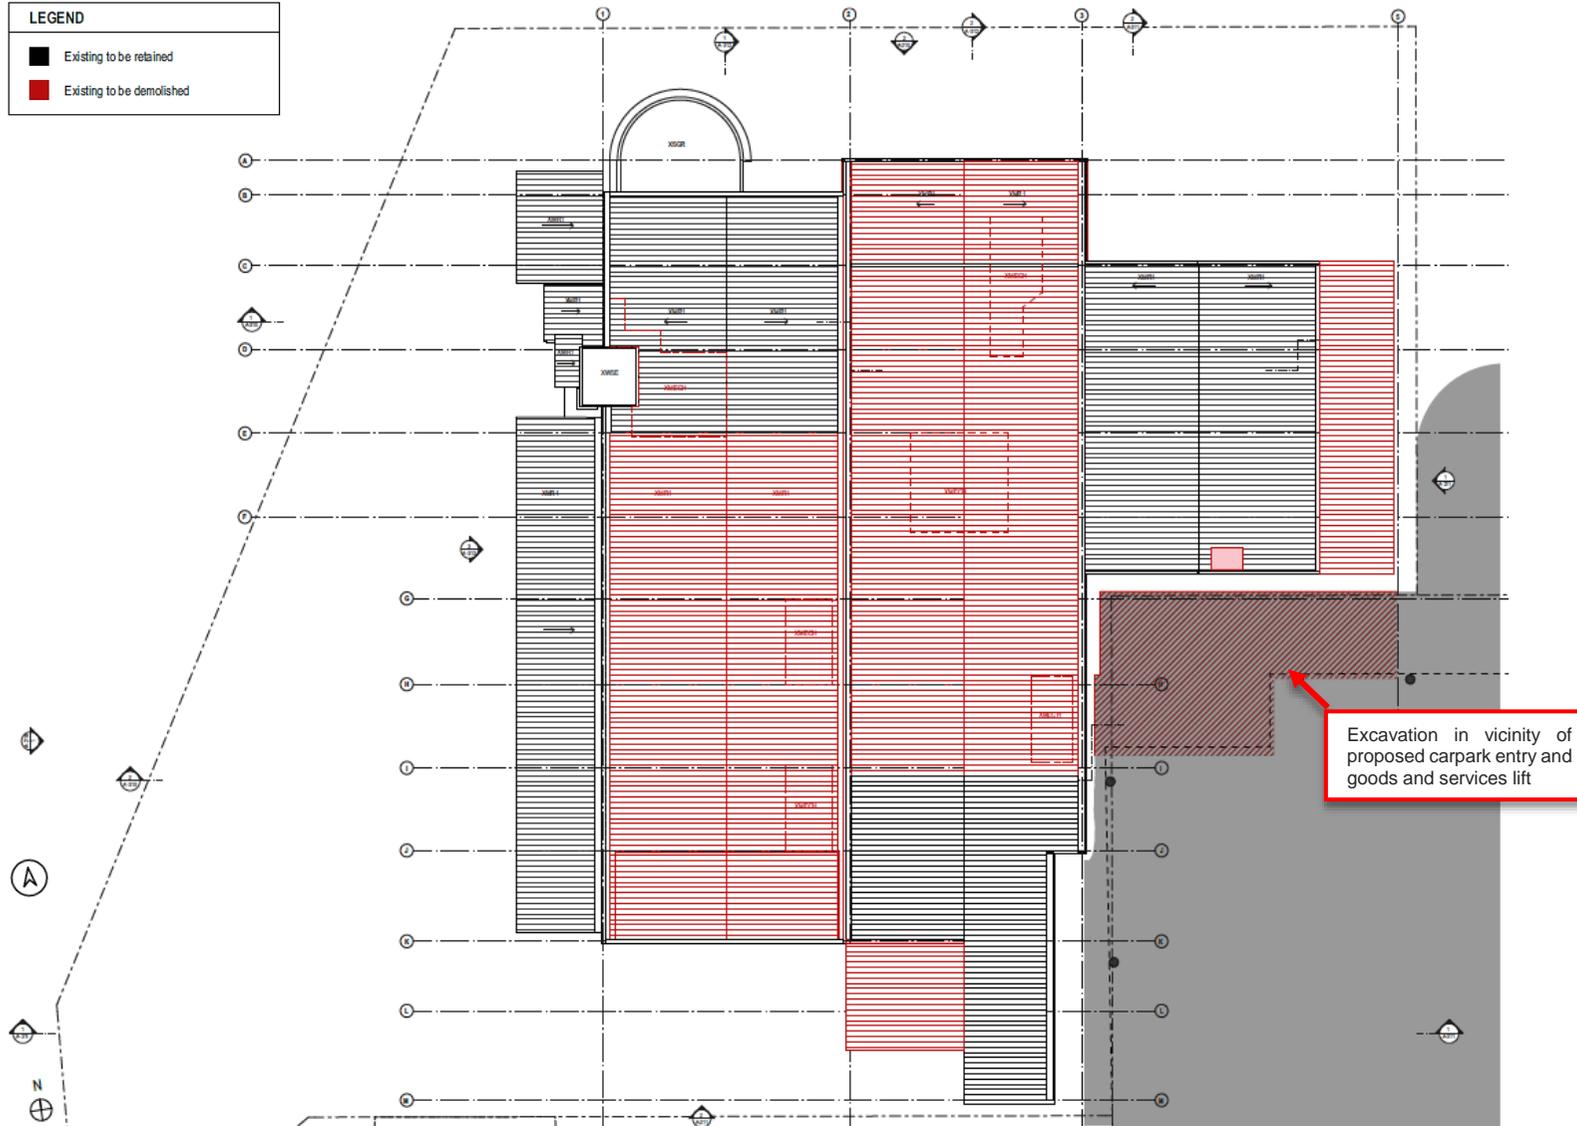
Extent of proposed excavations at Level 4, 800 Pittwater Road (Source: Level 4 Demolition Plan\_800, A-034, Rev A, 29/10/2019, Tonkin Zulaikha Greer Architects)
